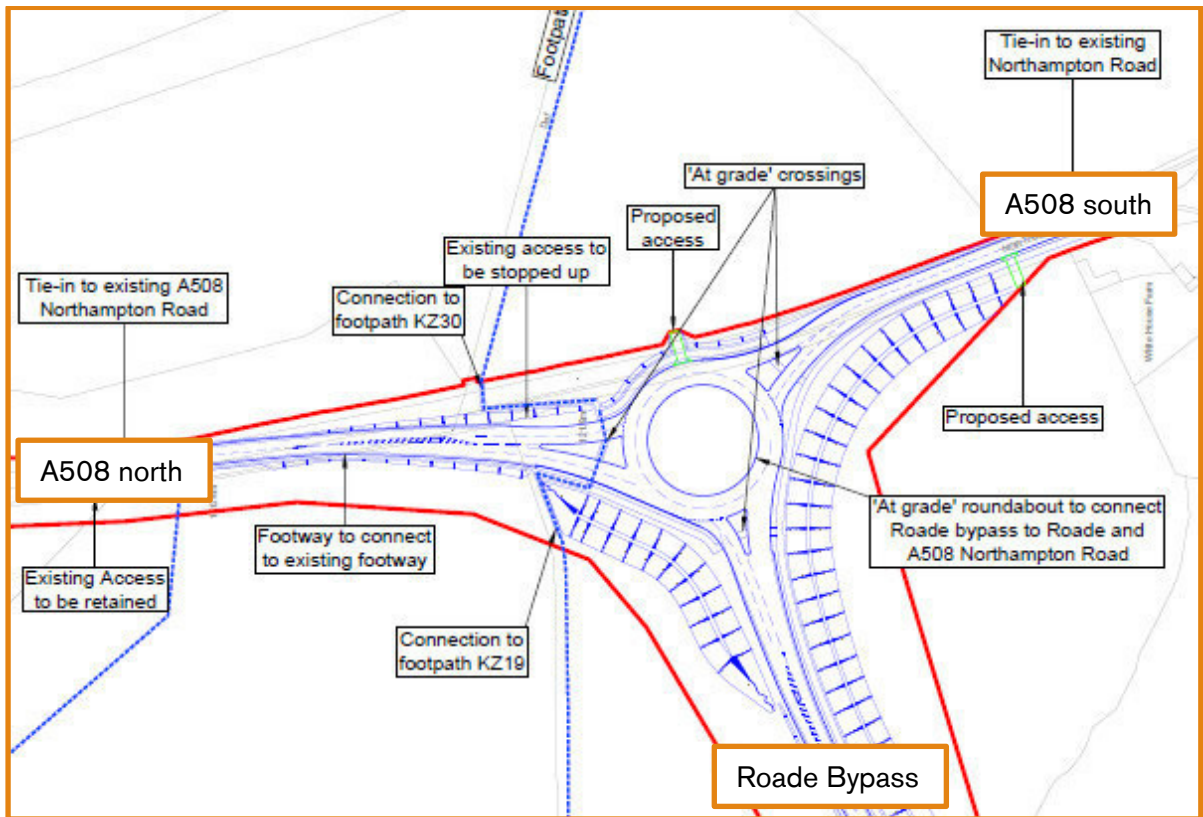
A508 Northampton Road/Roade Bypass 3-arm roundabout
